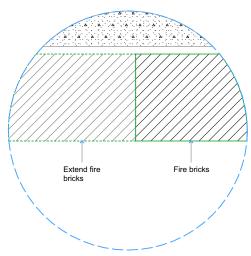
Plan View Fire Surround Opt. 10 Timber Cavity
